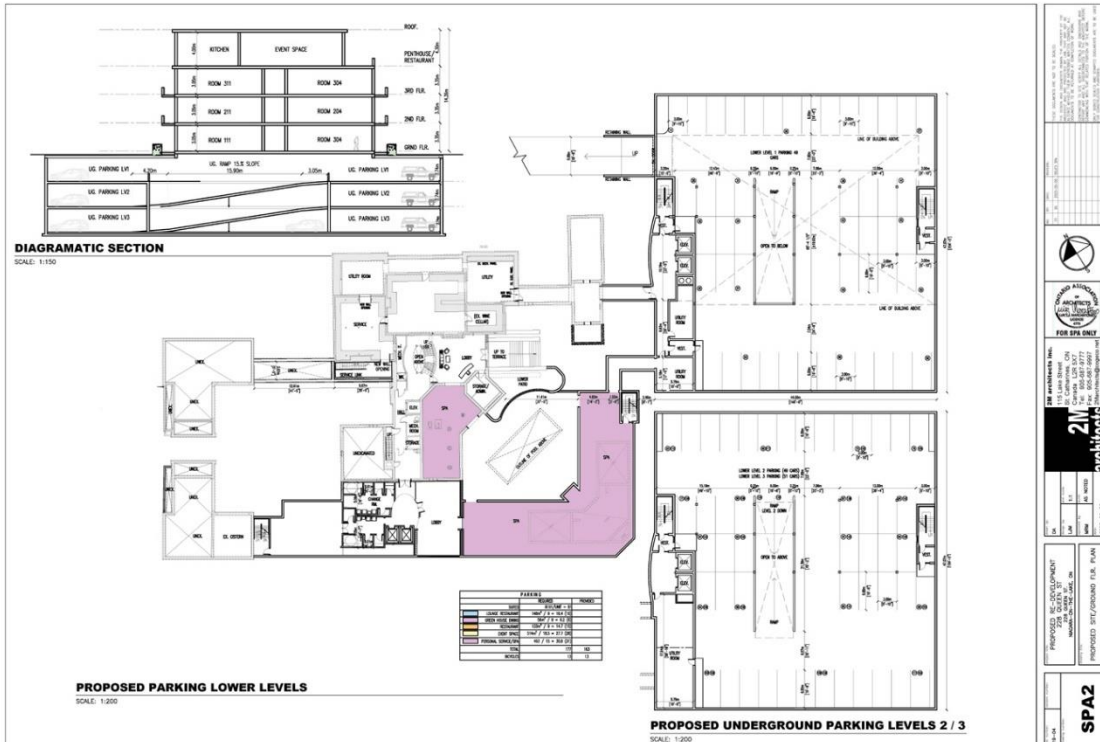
Sight Plan, Underground Parking and Spa Level, 2M Architects (APPENDIX II)
